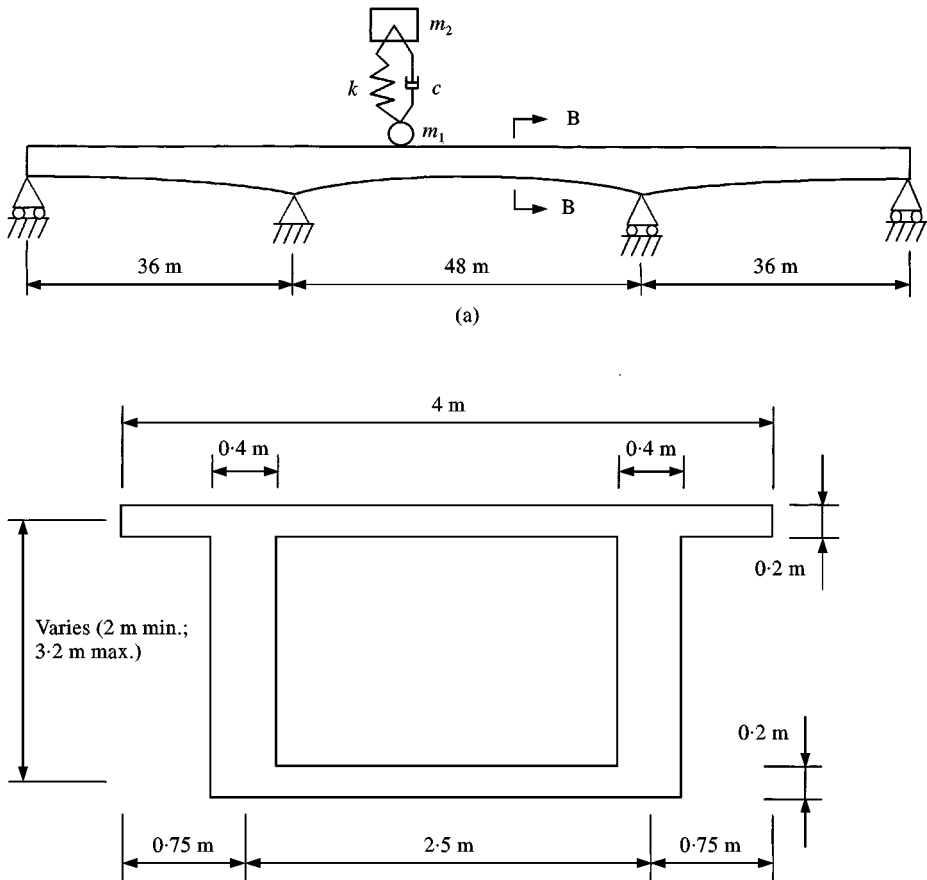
A three-span continuous bridge of parabolic soffit under a moving vehicle. (a) Elevation; (b) Section BB.
